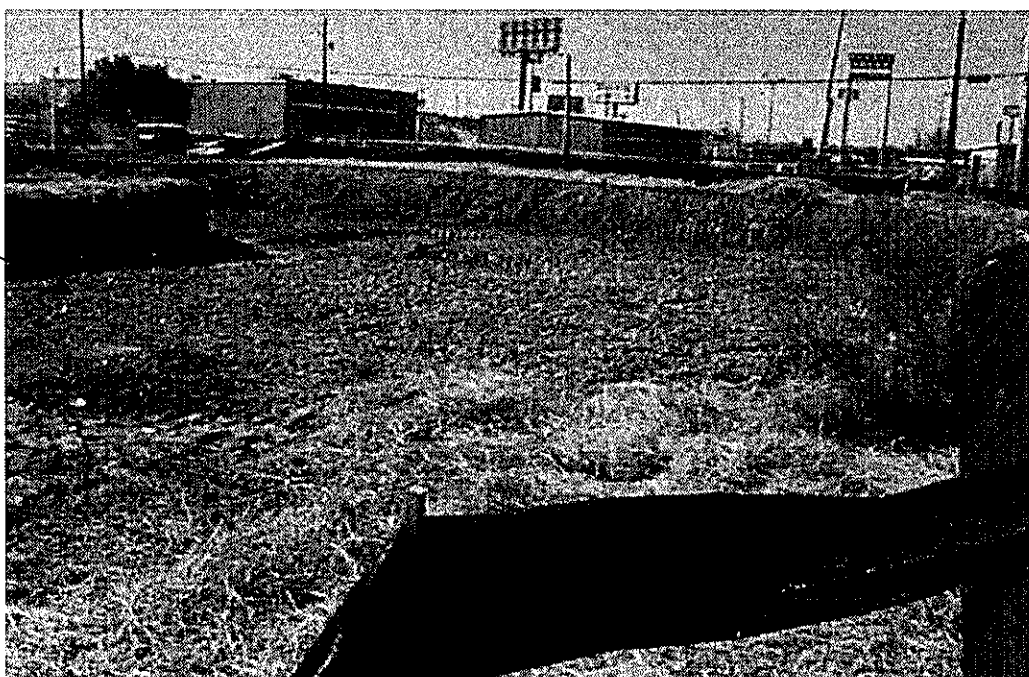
Phase I pre-construction – Headworks Building excavation and post-excavation sampling grid.
